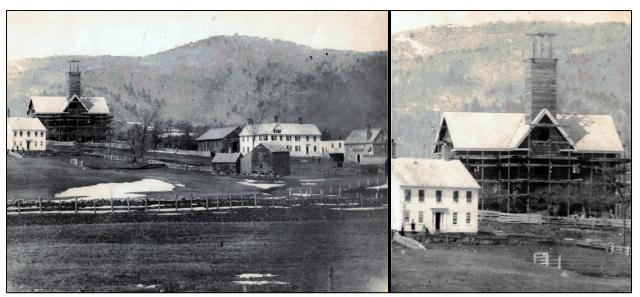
Effingham Town Hall under construction, 1858 (Collection of the Effingham Historical Society)
